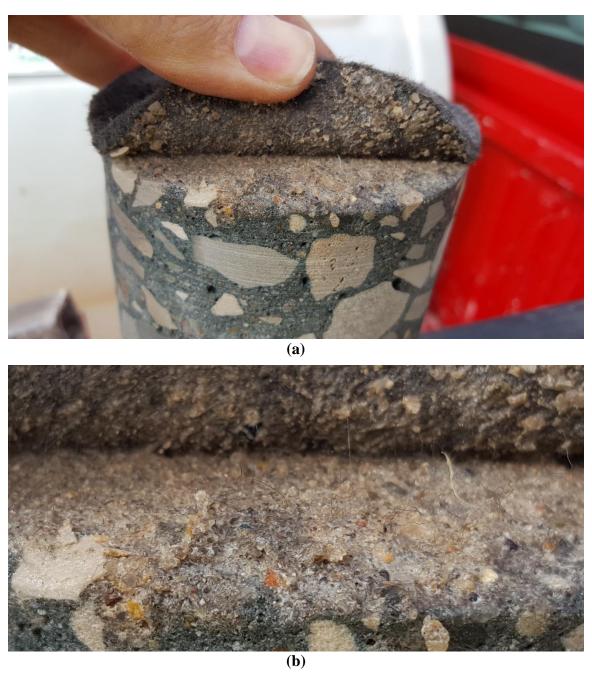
Images show (a) peeled back geotextile and (b) close-up view of fibers bonded to concrete
